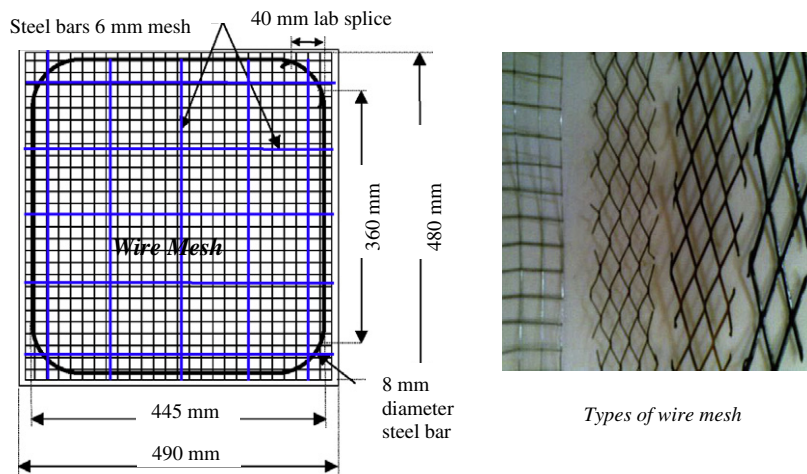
Alternatives reinforcement details of the cementitious slabs.
